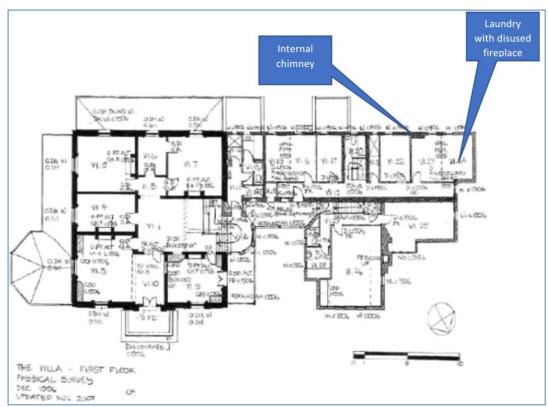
Existing first floor plan of the villa, including location of the chimney.
